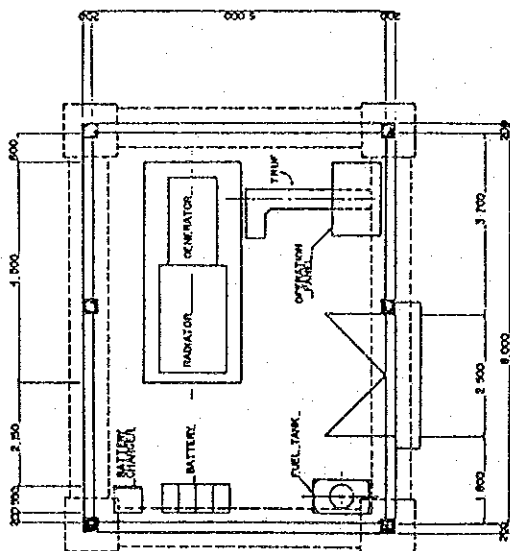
LAYOUT OF GENERATOR HOUSE
